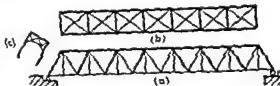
(a) A through Warren truss with vertical loads are borne on the lower chord (b) Top-chord bracing as seen from above (c) End-on view showing portal bracing.
